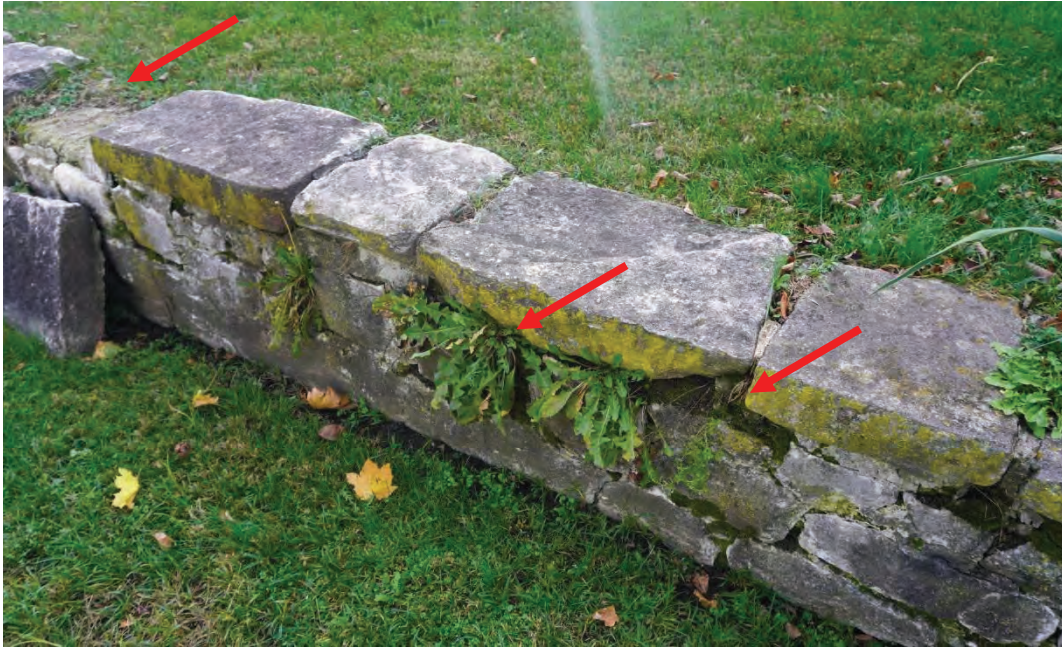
Retaining wall that runs from between front entrance and driveway is deteriorating throughout. Joints have filled with dirt. Multiple stone pieces no longer attached.
